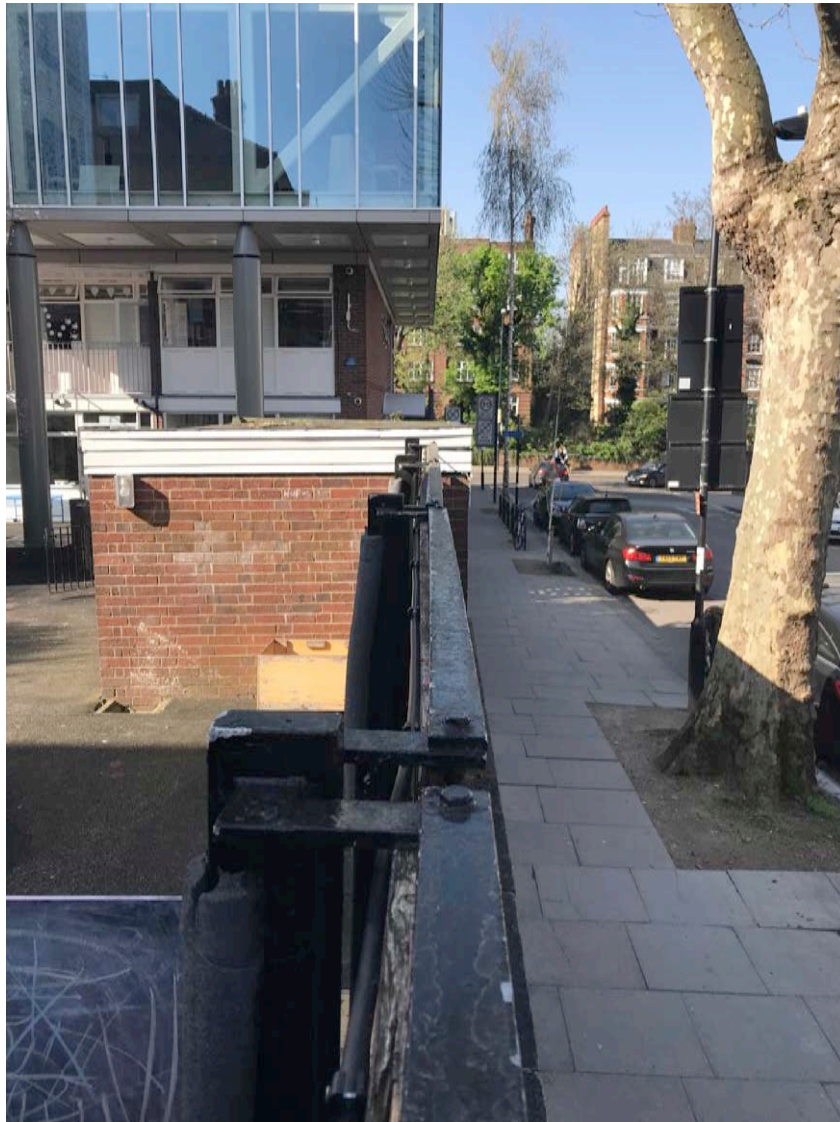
Existing staff room in playground. Ground level slopes up right towards No.1 Minster Road. Area of proposed development.
